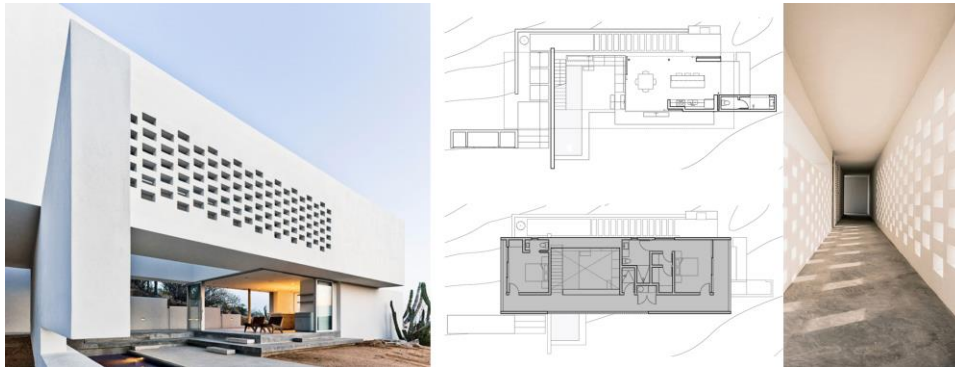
Perforated main wall of cubic shell; main floor plan - first floor plan; light game
